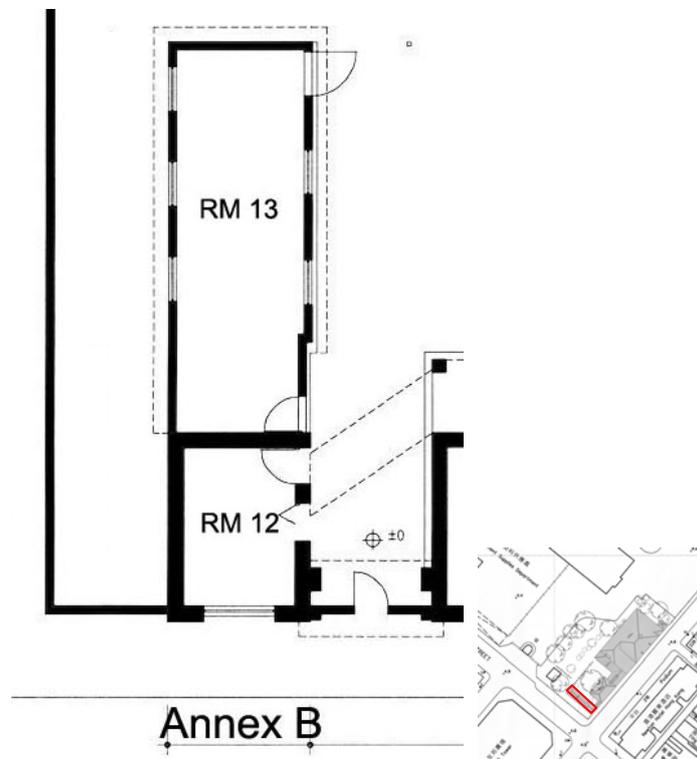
Existing ground floor plan of Annex B at No. 12 Oil Street, North Point (1:200).
